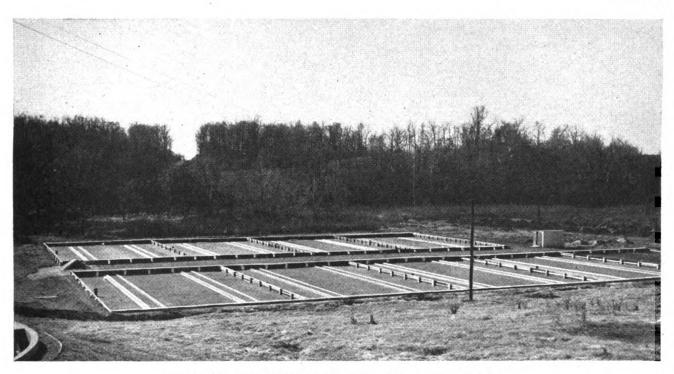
Sludge beds with wooden walls. Note runways for trucks.
